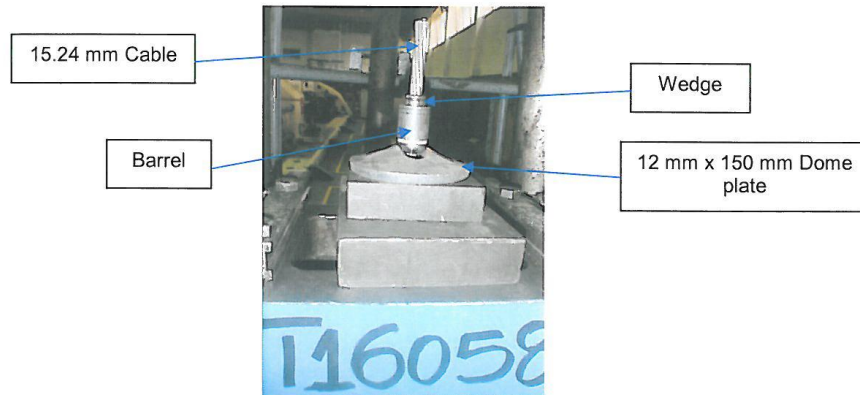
25 t Cable anchor assembly installed in the testing machine.
